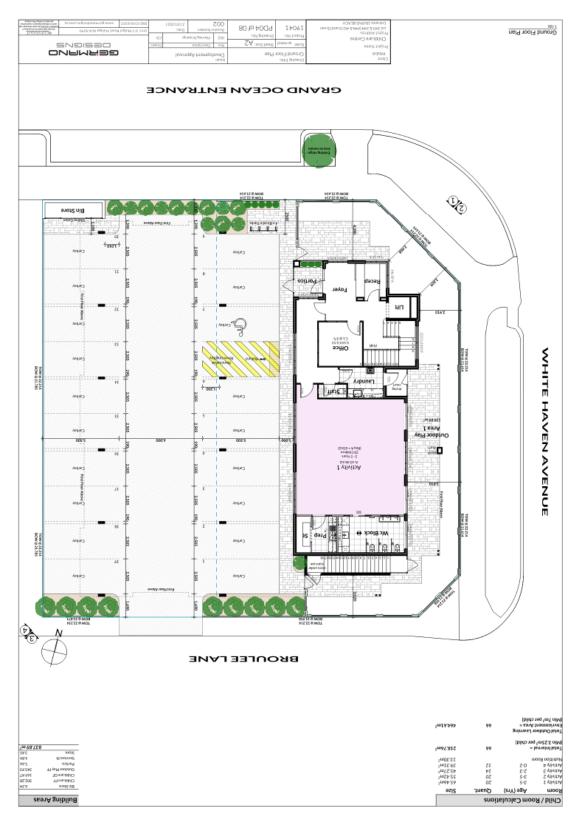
GROUND FLOOR PLAN (drawing rotated to shown North at top of page)
